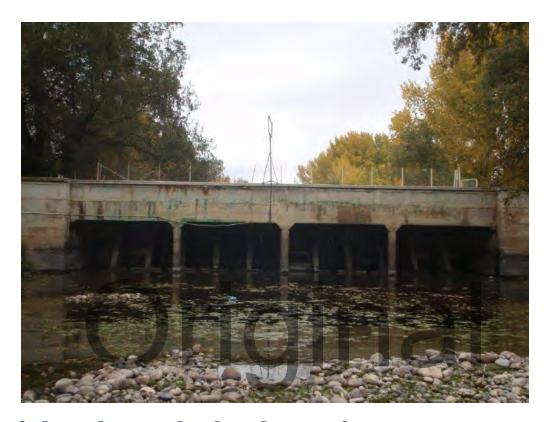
EXISTING FRANKWOOD ROAD BRIDGE DOWINSTEAM SIDE
